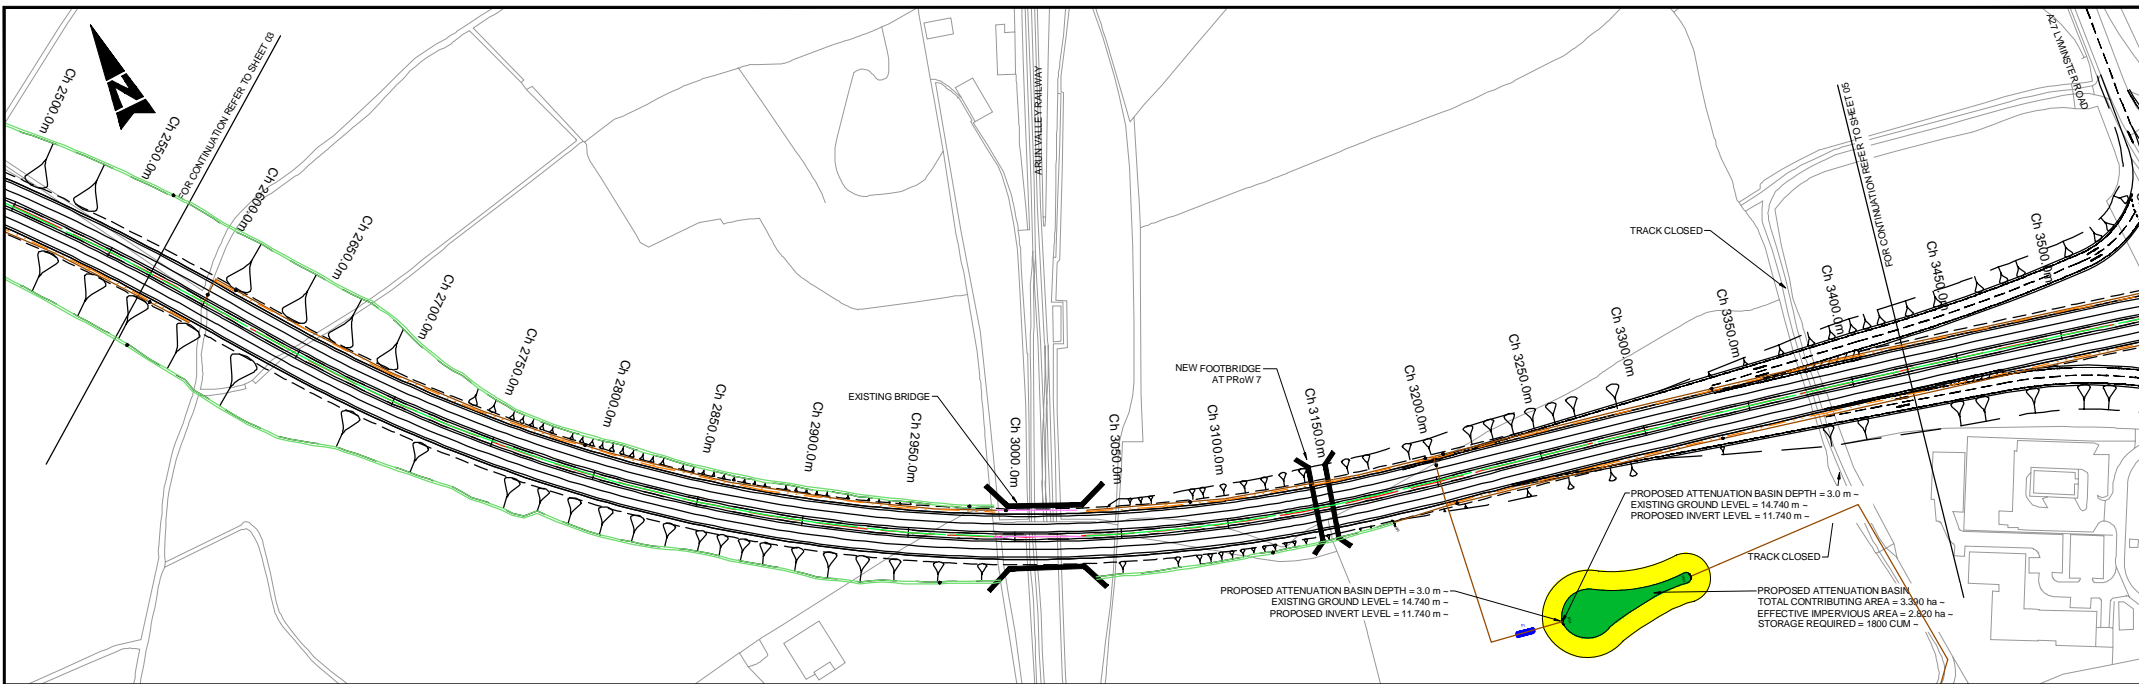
Drawing Number: HE55123 - WSP - HDG - A27AR - DR - D - 0503
